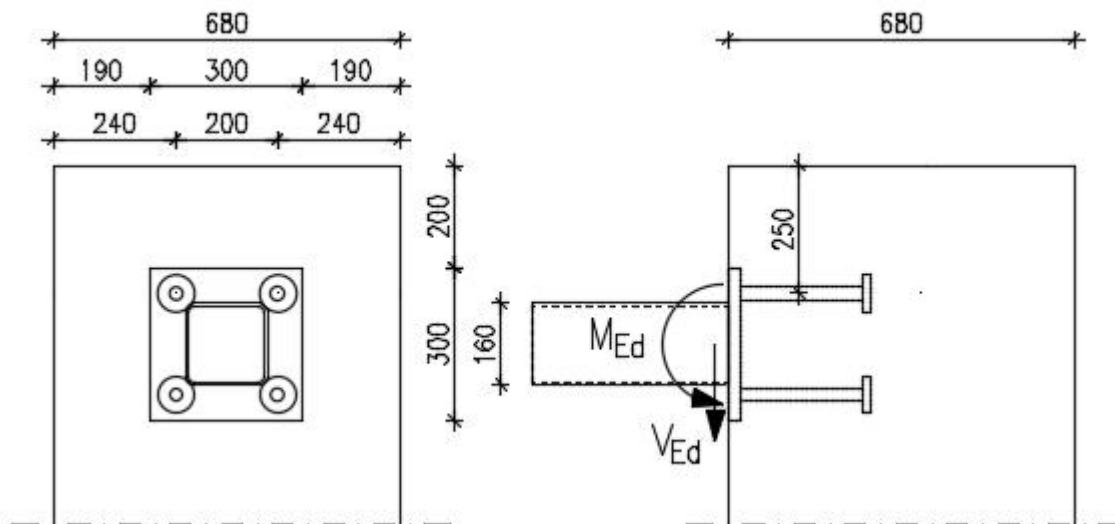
Design example for JKL fastening plate, fastening plate in the upper part of a column.
